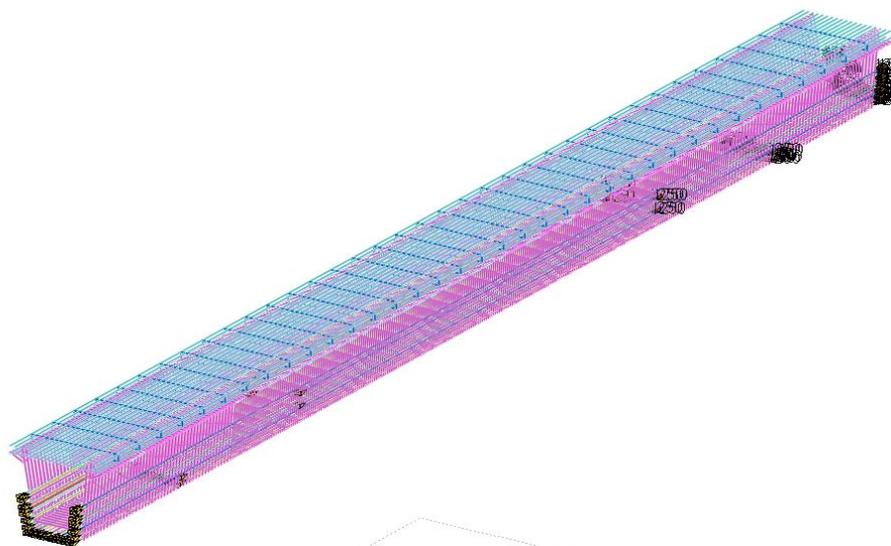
Reinforcement layout and prestress force application on tendons.
